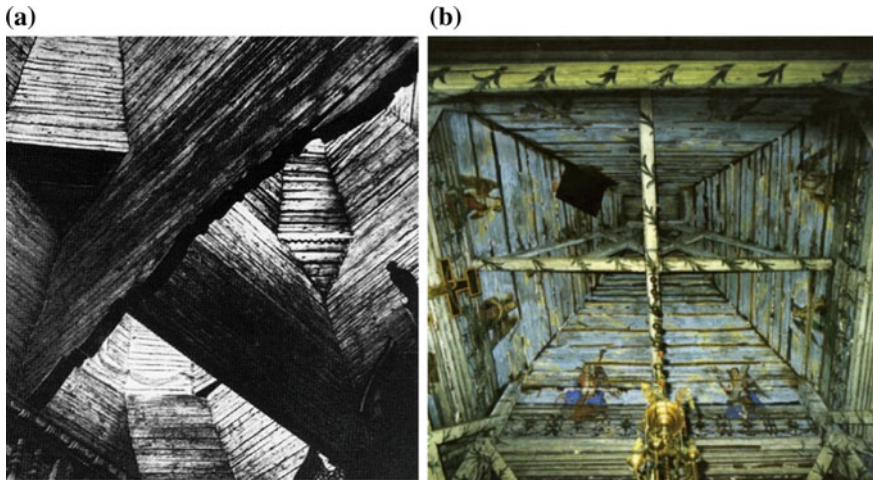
Examples of struttings of a church tower according to [8], a with vertical full membranes, b with vertical truss membranes
